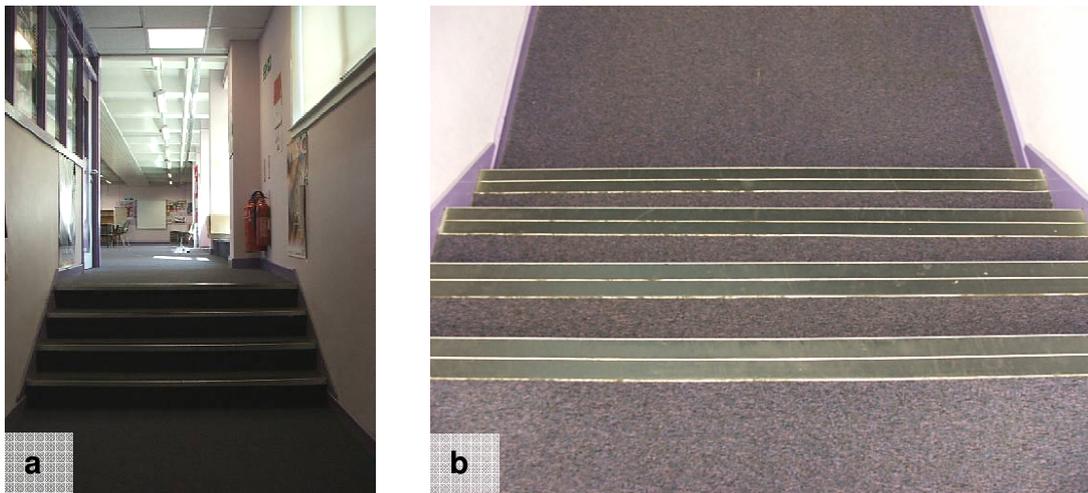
Inaccessible stairs in refurbished school (a) looking up and (b) looking down.
